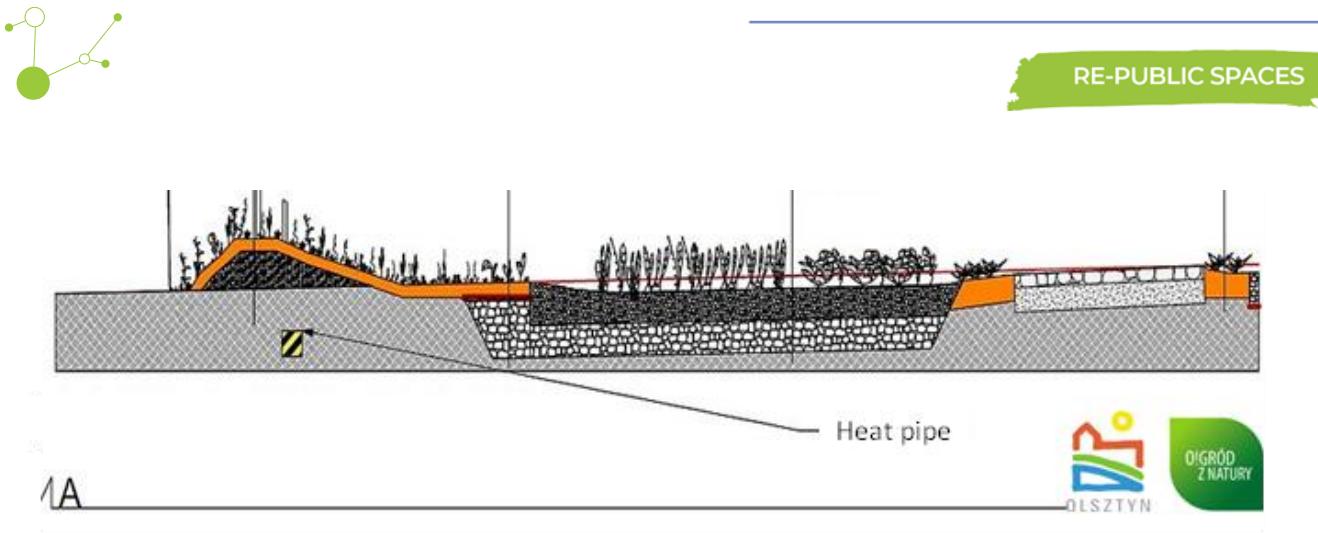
Dry garden in Nasze Podwórko, Olsztyn Fig.5 (source: City Architect's Office of Łódź)
